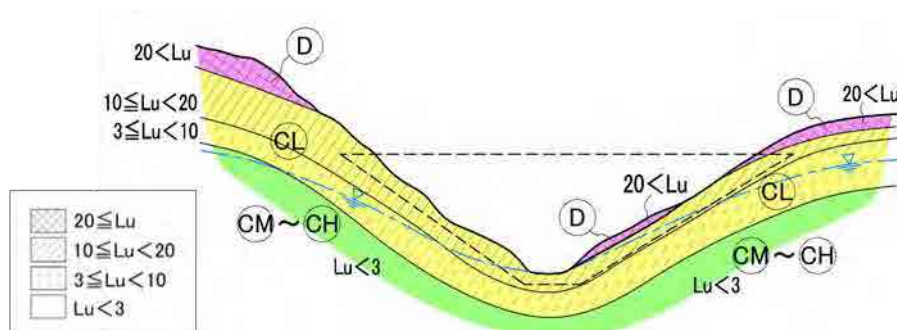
Example of Excavation Line Setting for Impervious Zone Foundation
